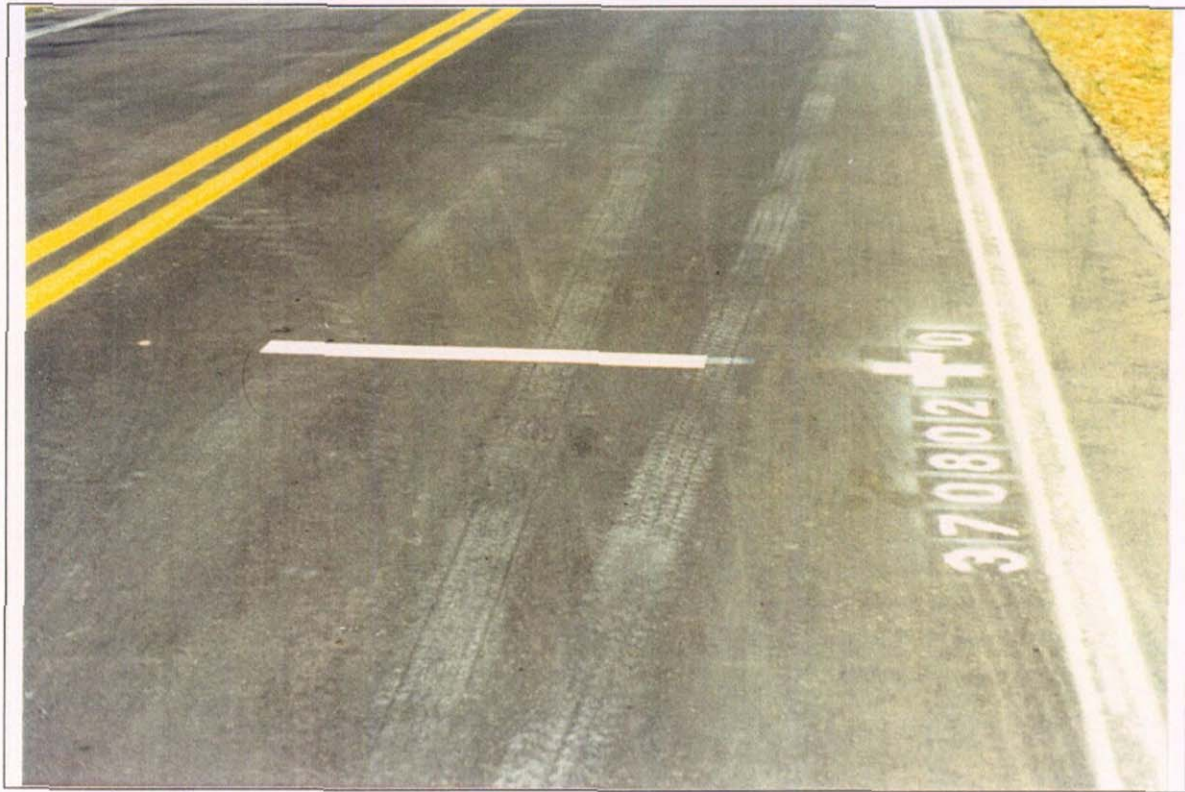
Pavement Markings on Section 370802 Showing Starting Stripe
